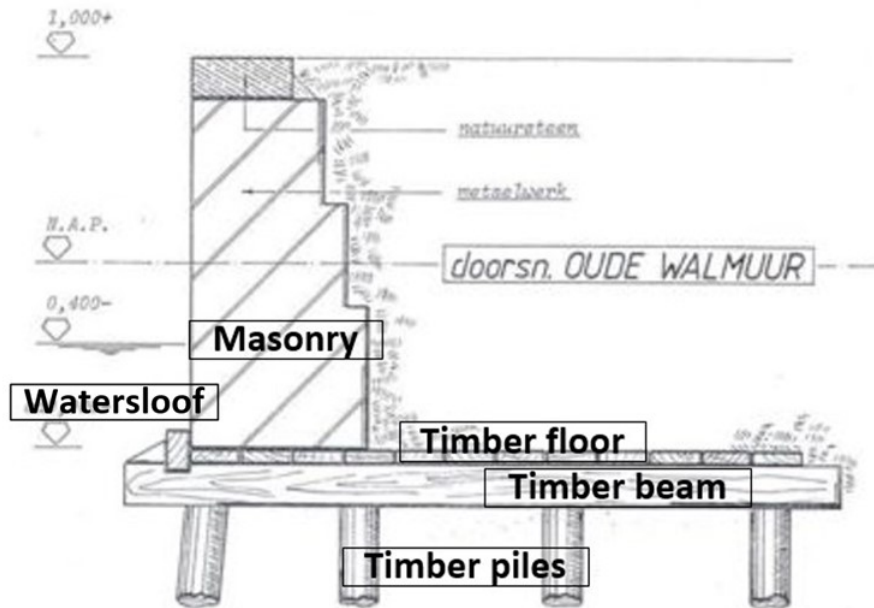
Schematisation of a typical gravity wall on wooden foundations.
